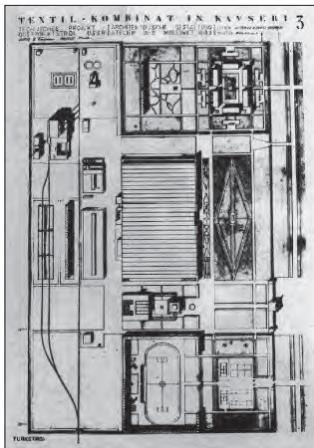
Sümerbank Cotton Textiles Plant, site plan.
